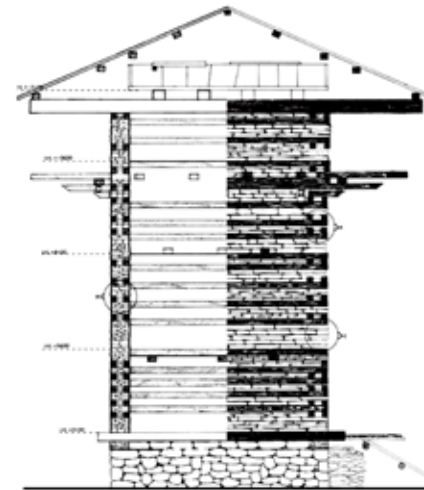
Section and elevation detail (Source: Sharma, N., 2020)
